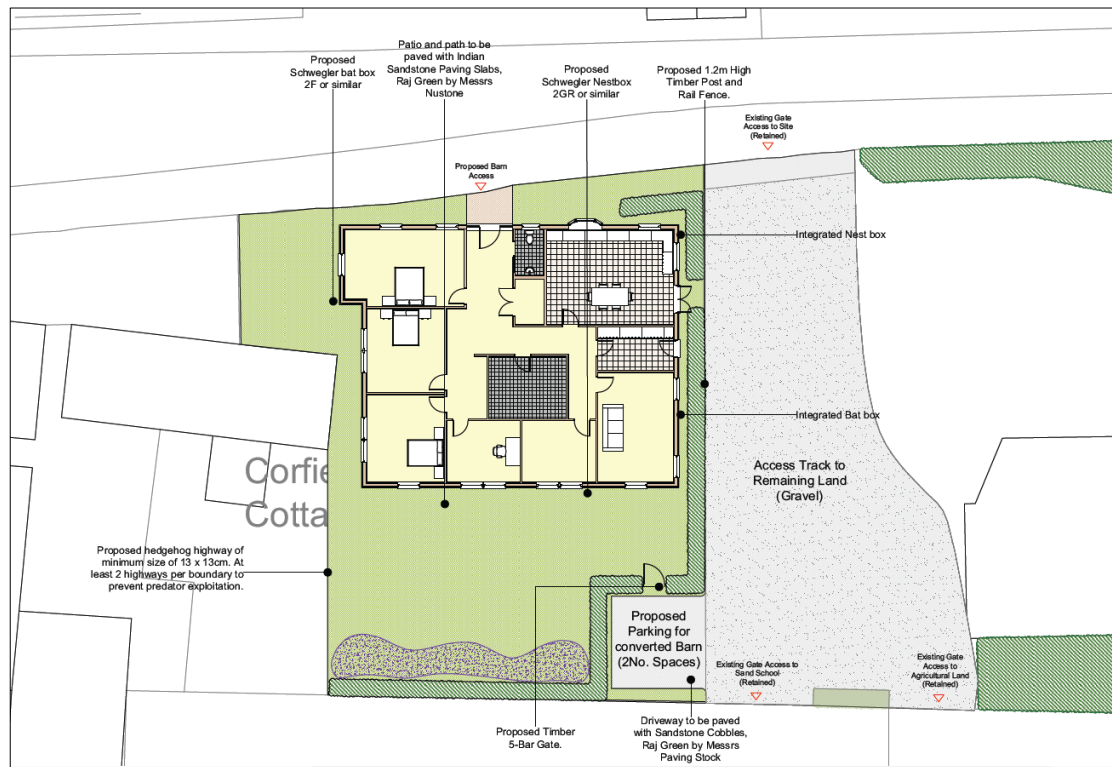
EXTRACT OF PROPOSED SITE PLAN
